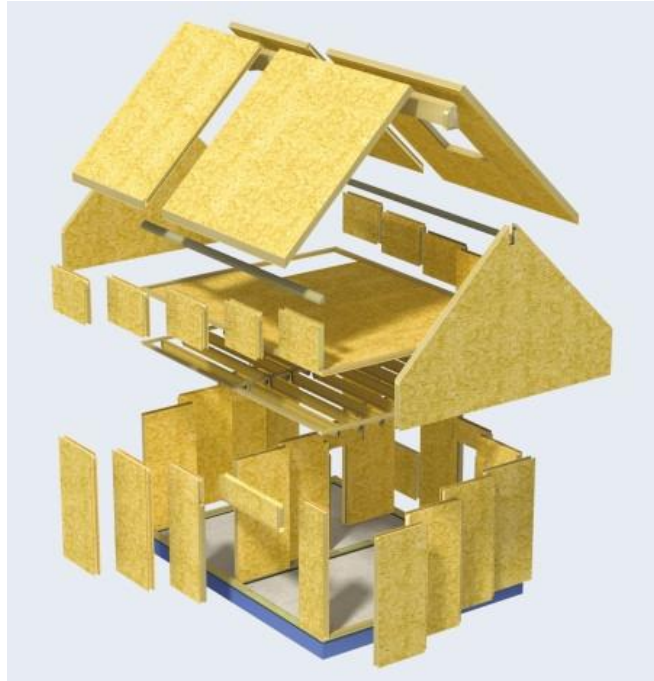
Structural Insulated Panels (Kingspan TEK Ltd, 2007)
